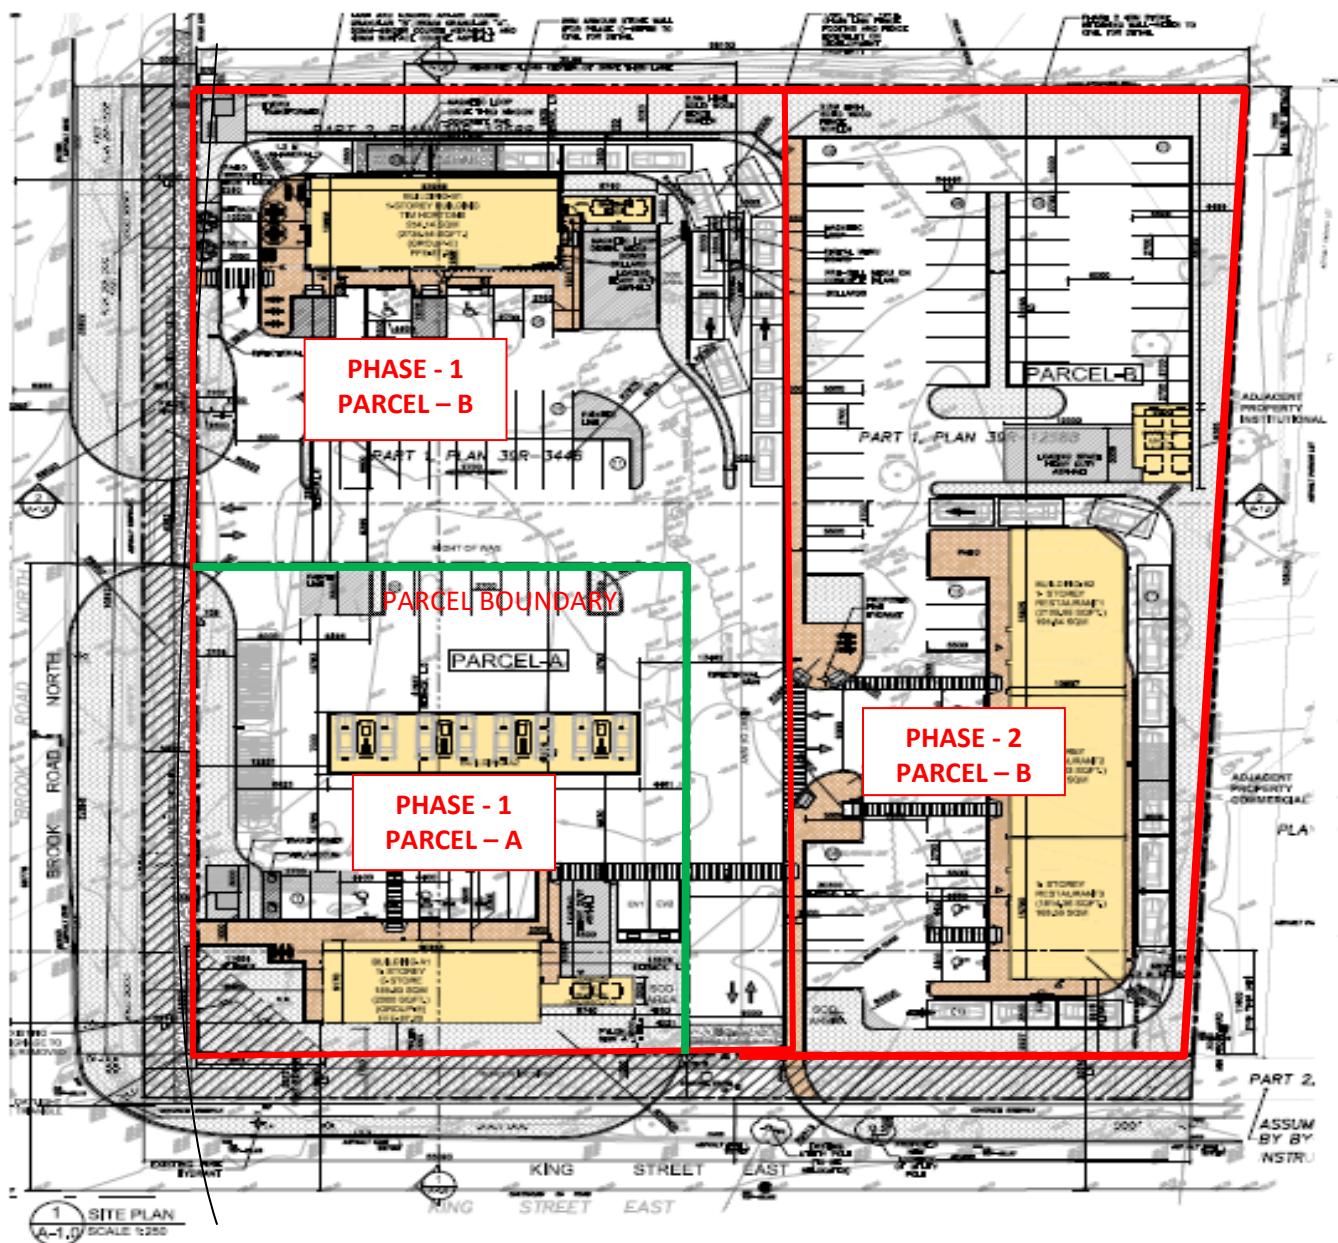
PROPOSED DEVELOPMENT PLAN
